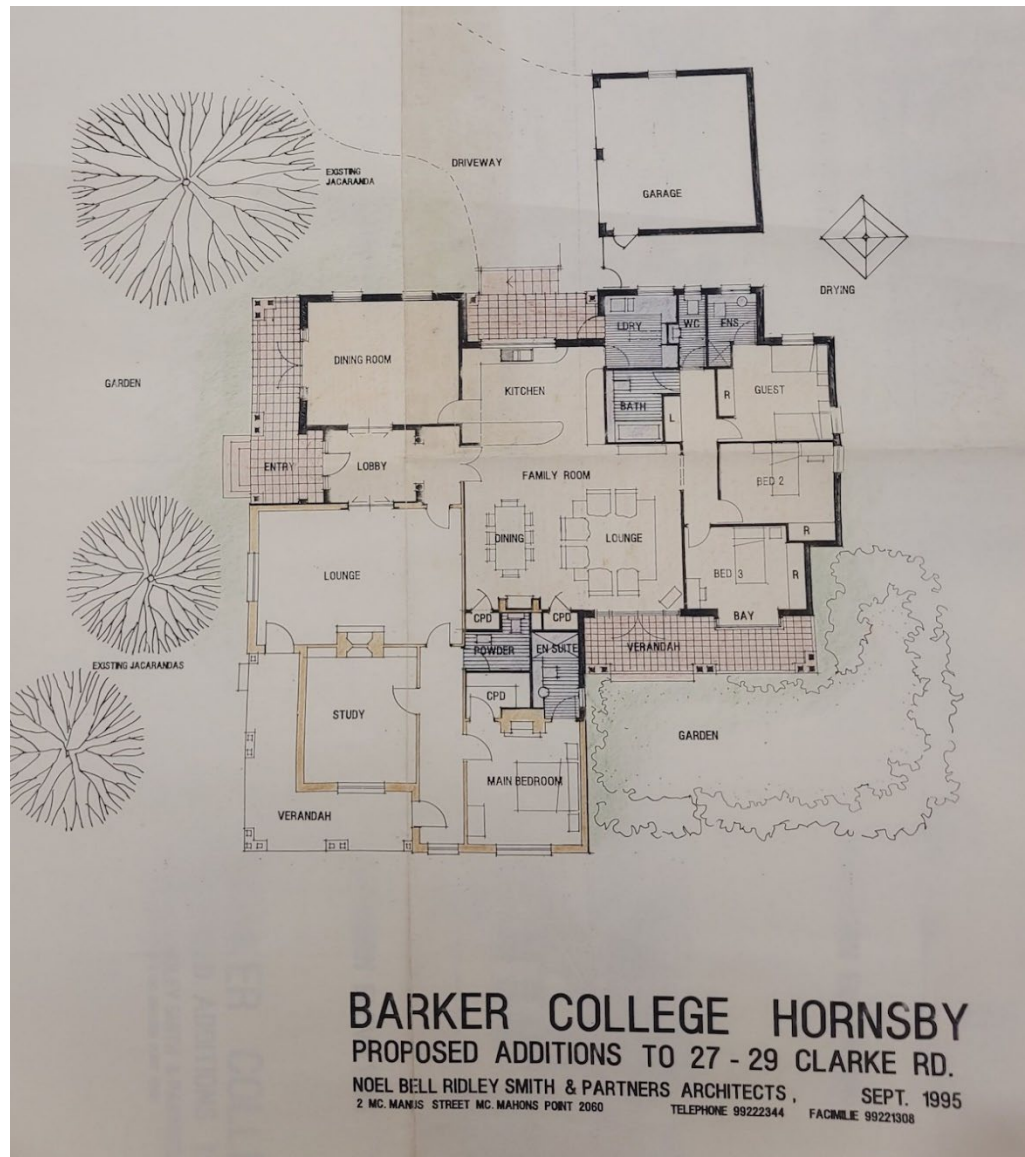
Plan for 'Proposed Additions to 27-29 Clarke Road', Barker College, Hornsby, prepared by Robert Staas from Noel Bell Ridley Smith & Partners, architects, dated September 1995. (Source: Barker College Archives, Plan M2015)
